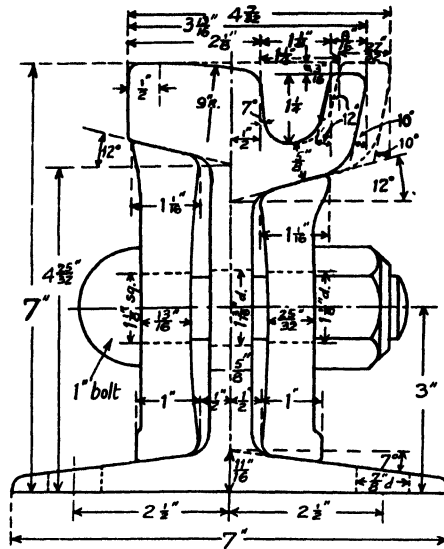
DIMENSIONS OF B.S. NO. 8 TRAMWAY RAIL AND FISH-PLATES
